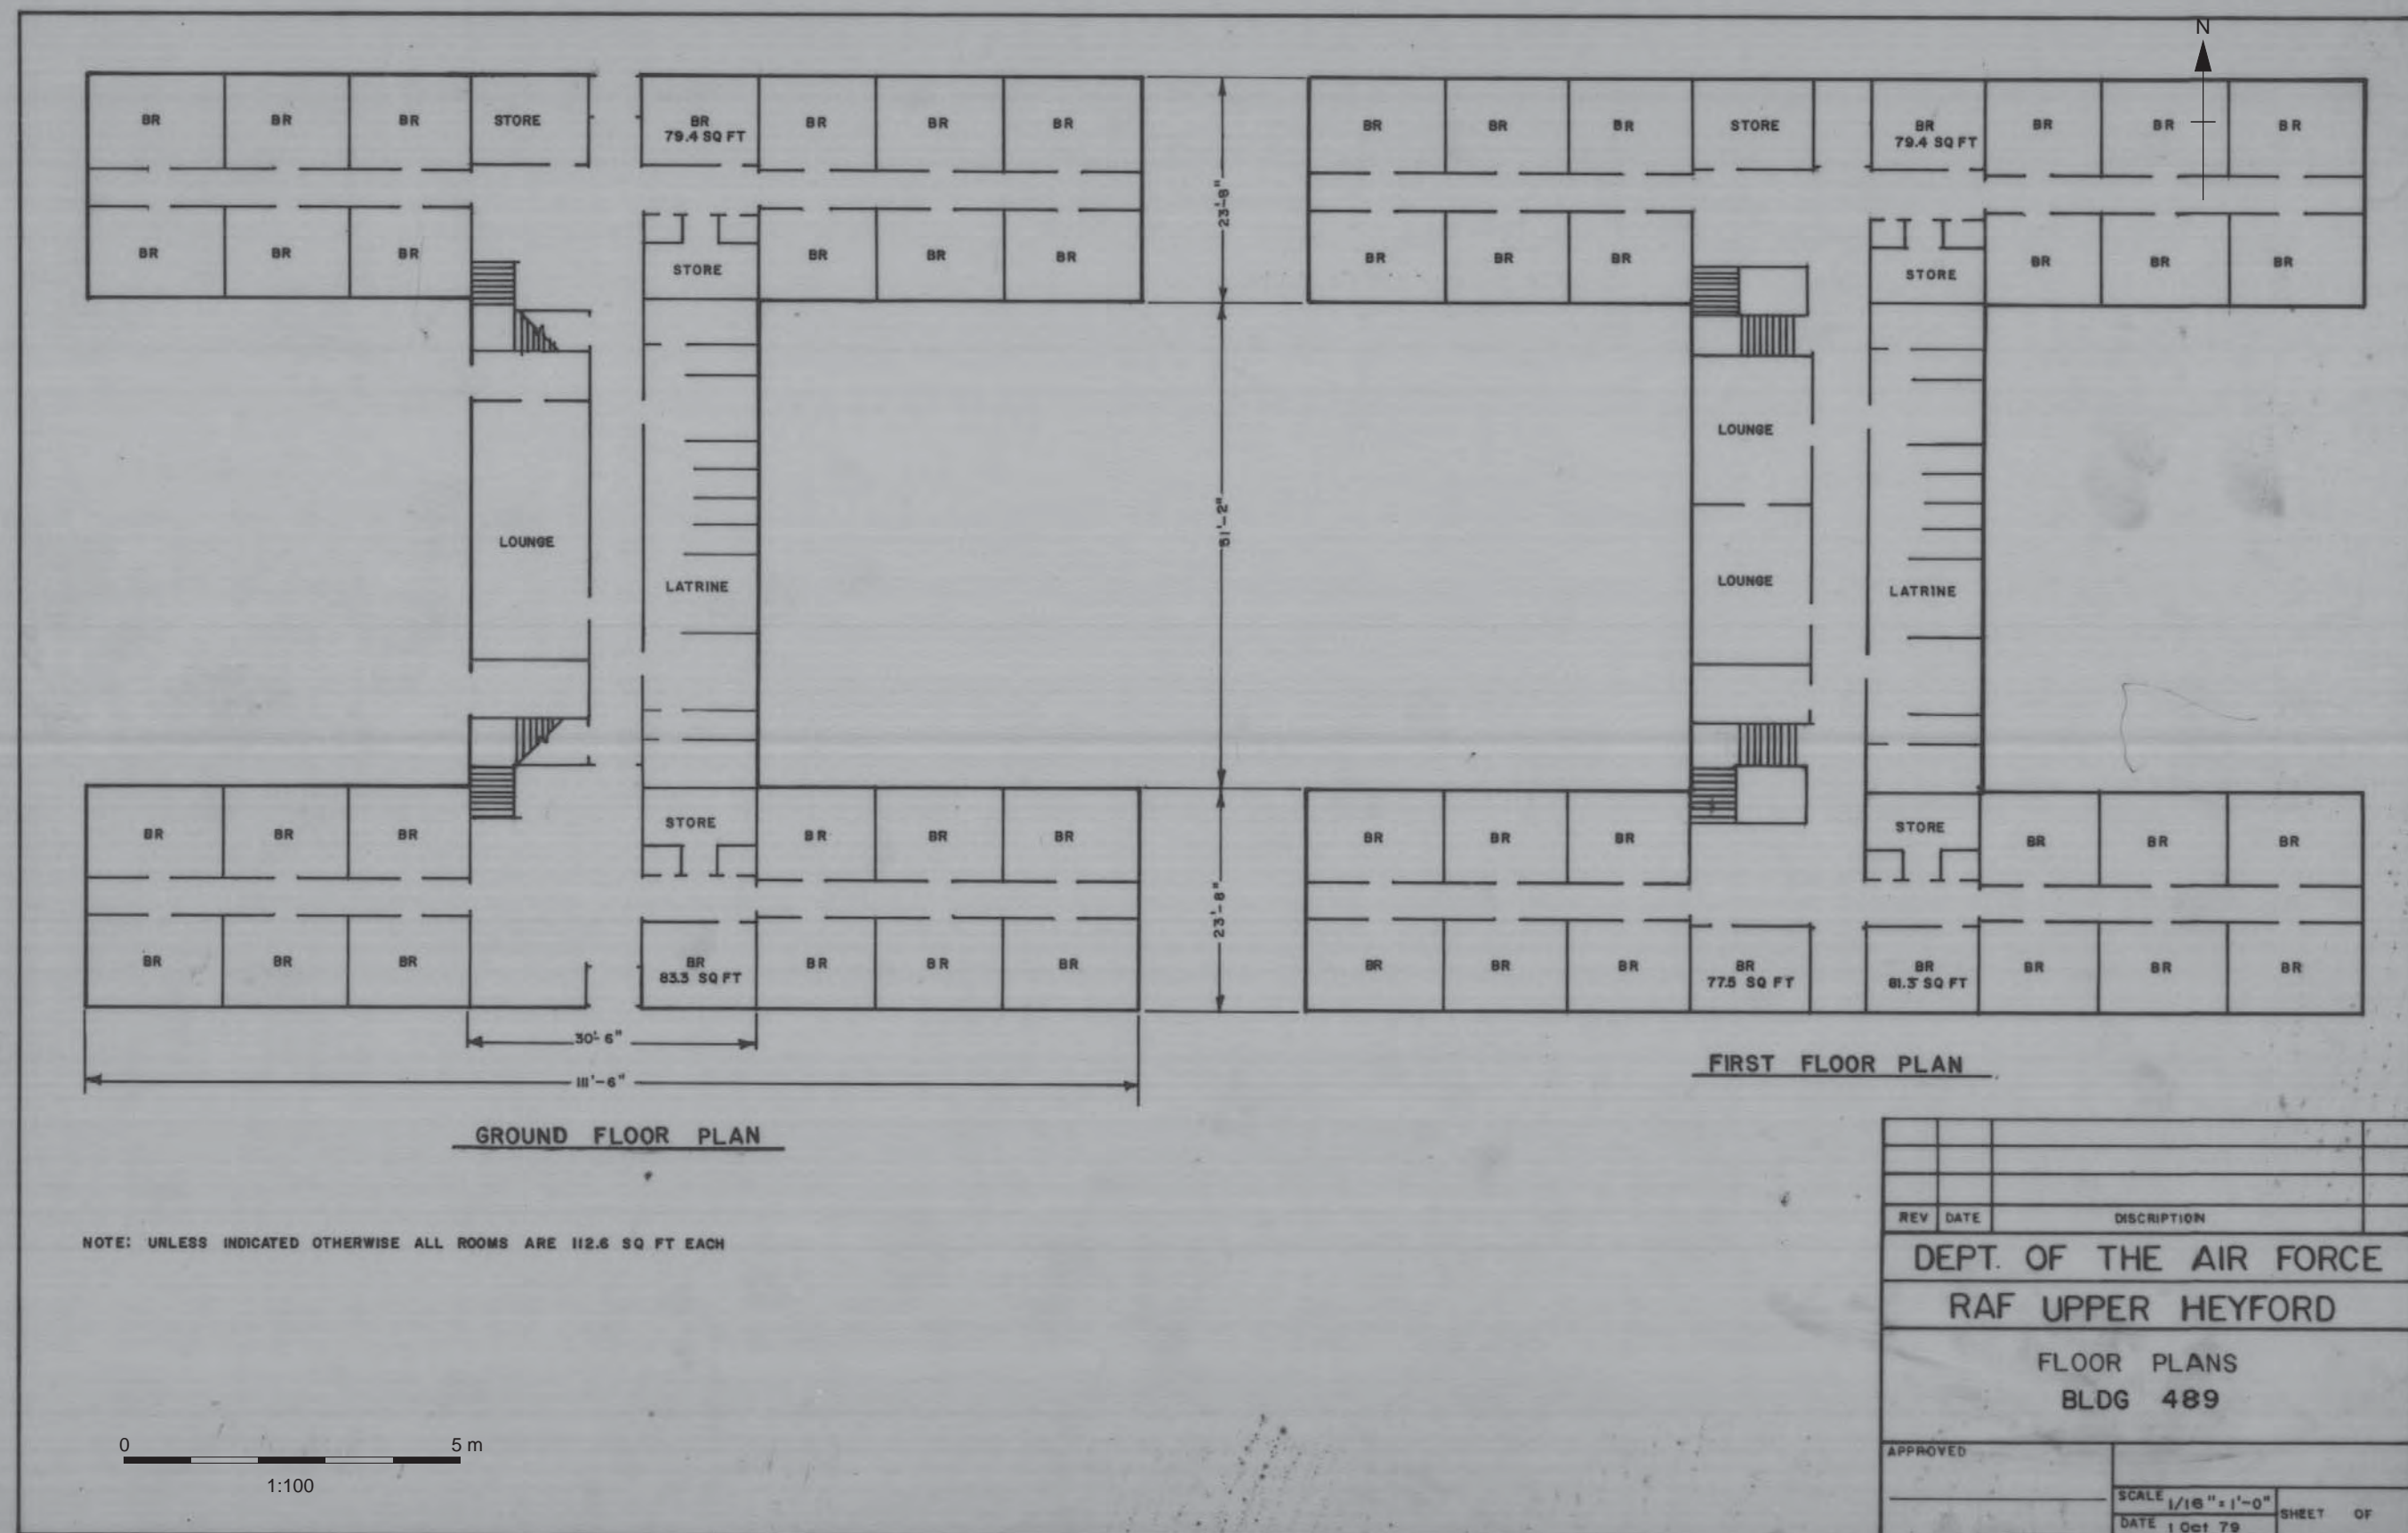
, 498 & 500.1 Building 489 Ground and First Floor plans (1979)
